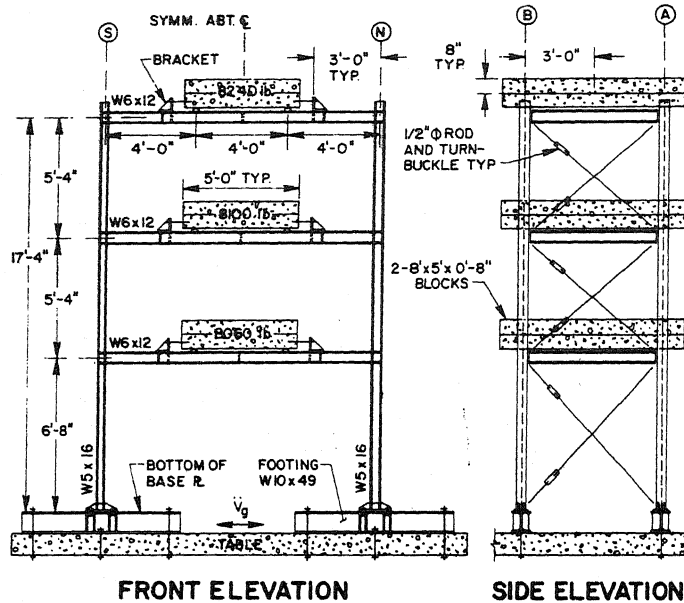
ELEVATIONS OF TEST STRUCTURE
